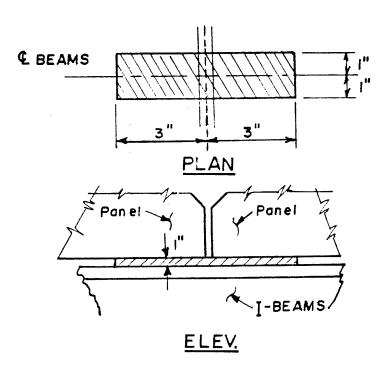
Typical Key Way and Bearing Details Between Adjacent Panels.
